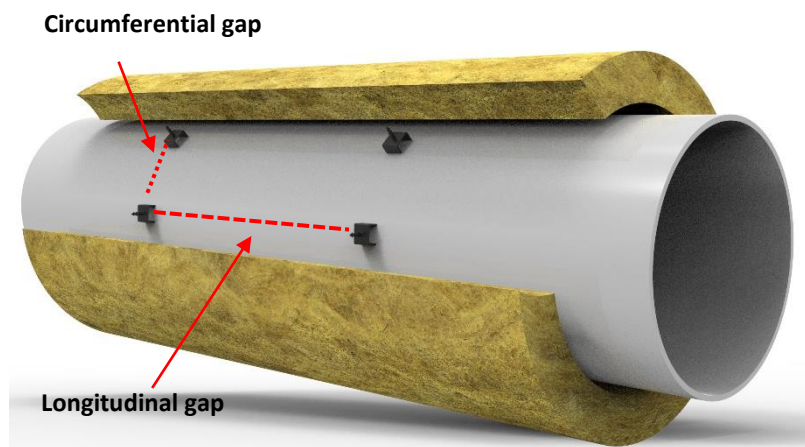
Typical spacer arrangement showing Longitudinal and circumferential gaps
